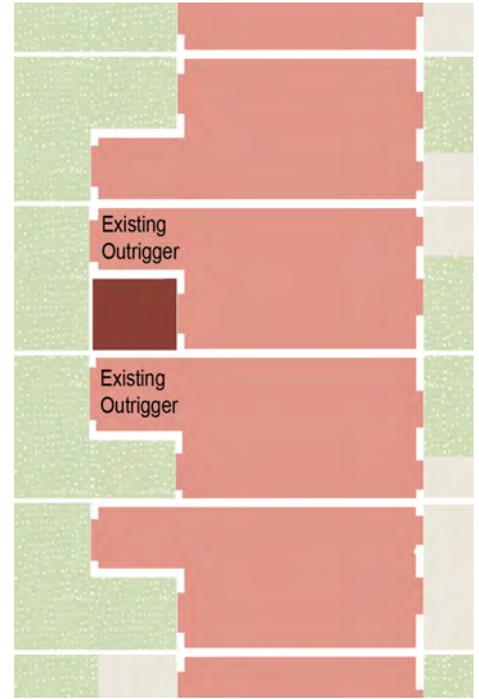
Example of where a two-storey rear extension may be acceptable where it would be infilling between existing extensions / outriggers and would not result in no additional impact on neighbouring amenity.
